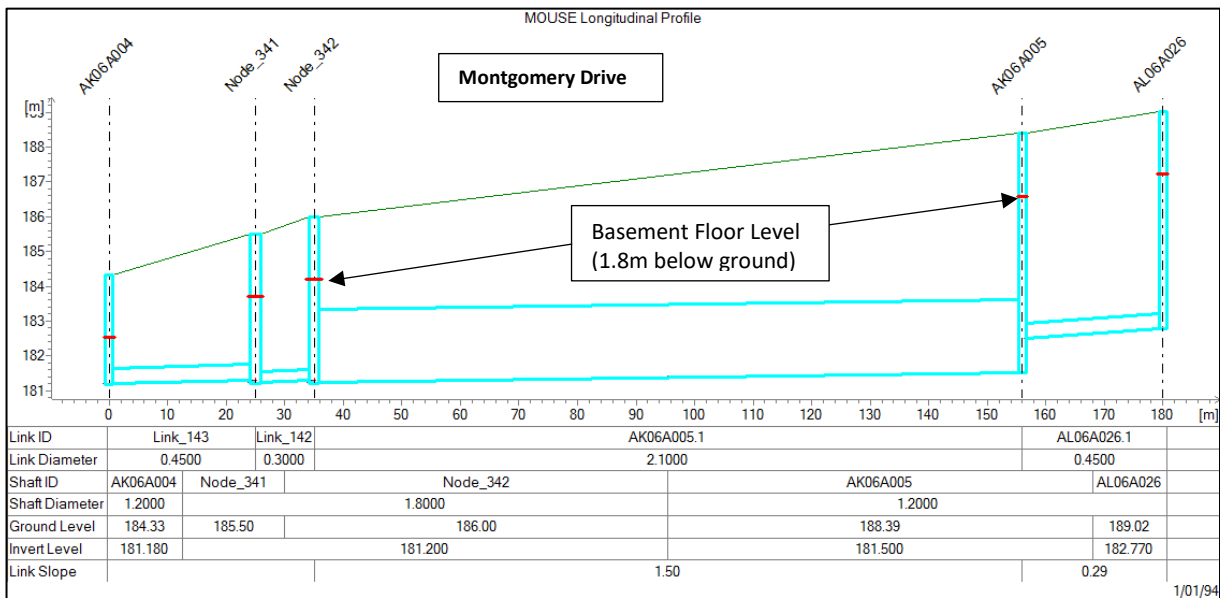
Profile of the Inline Storage Facility on Montgomery Drive
